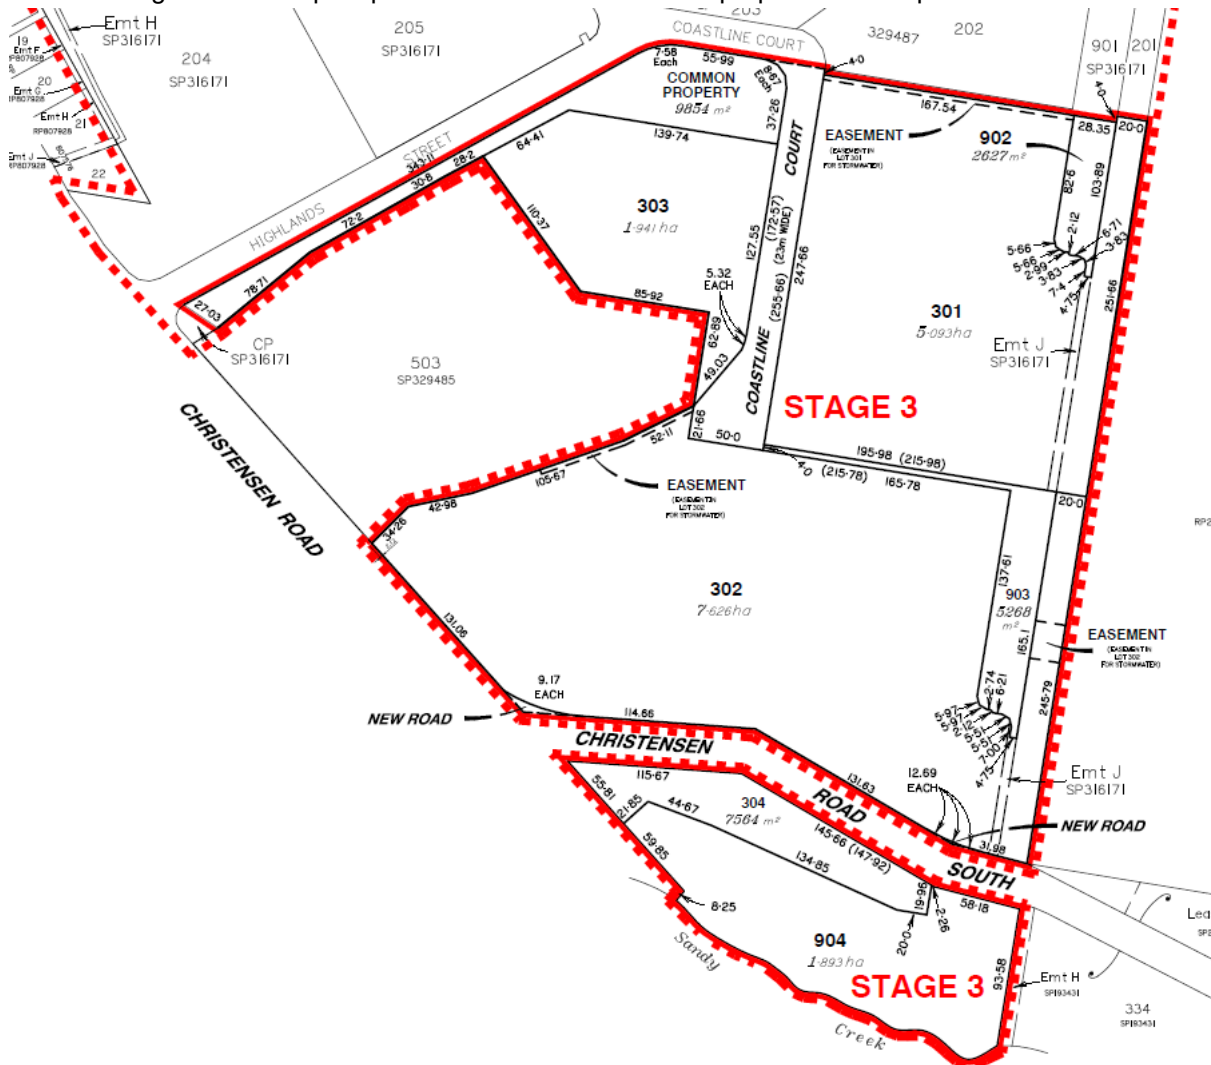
Proposed plan of subdivision (Source: Gassman Development Perspectives)
